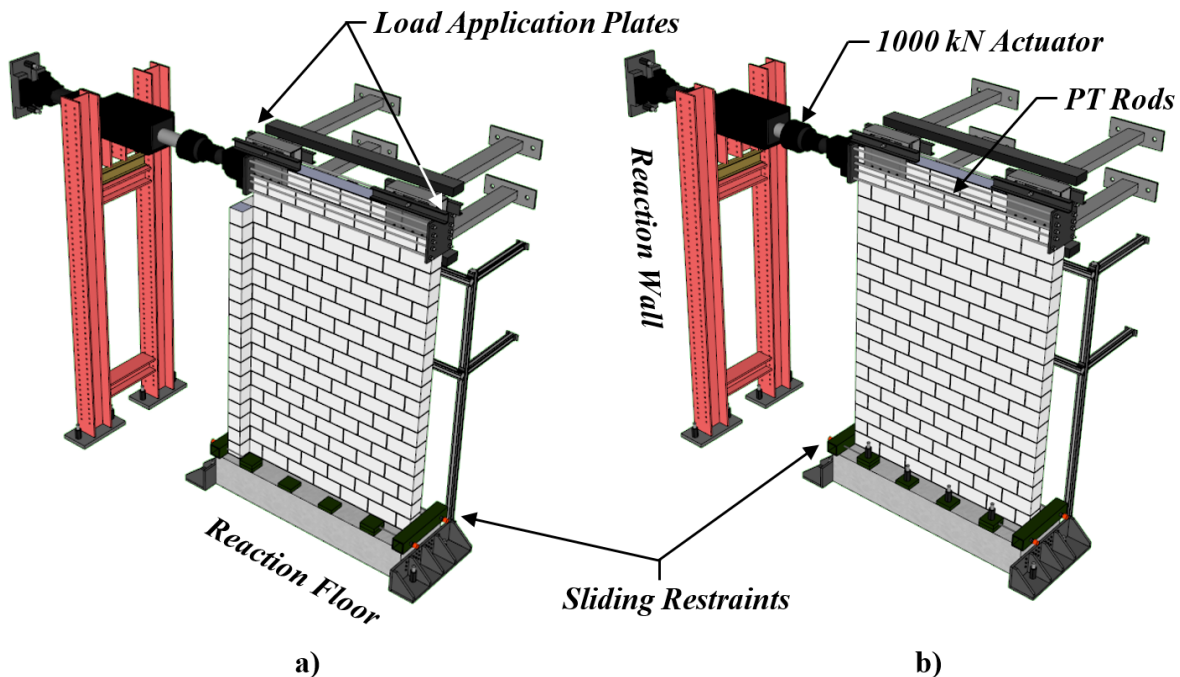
Test setup for specimens: a) W6 and W7, and b) W8.
